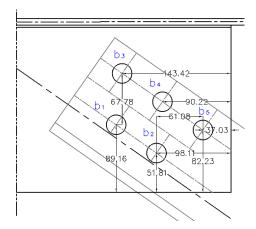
Positioning of bolts in diagonal 13 connecting to the gusset (dimensions in [mm])
